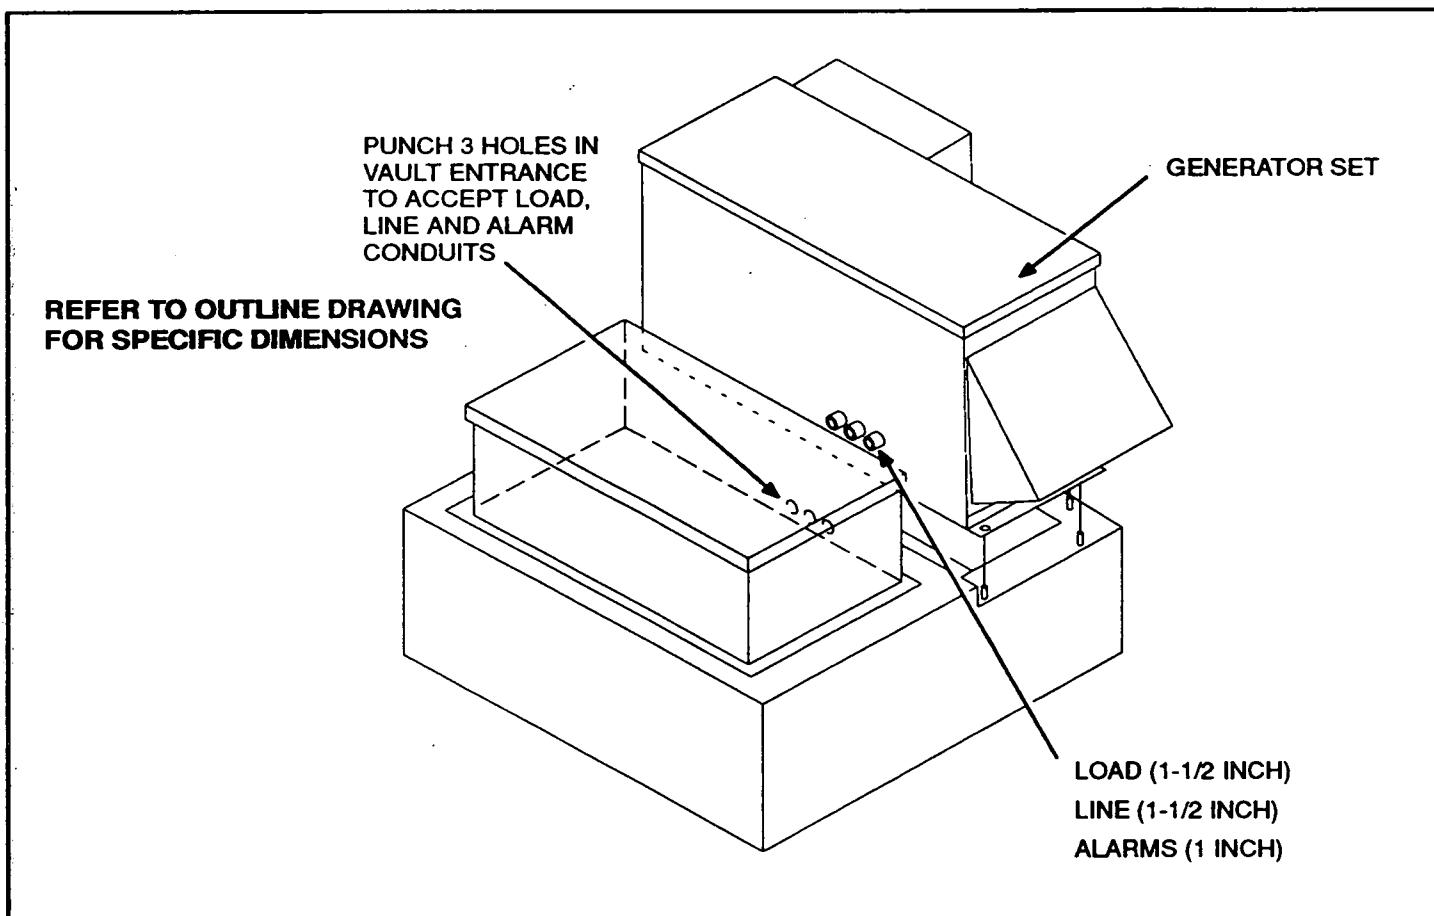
STANDARD FLEXIBLE CONDUIT FOR LOAD, LINE AND ALARM SIGNAL WIRING
